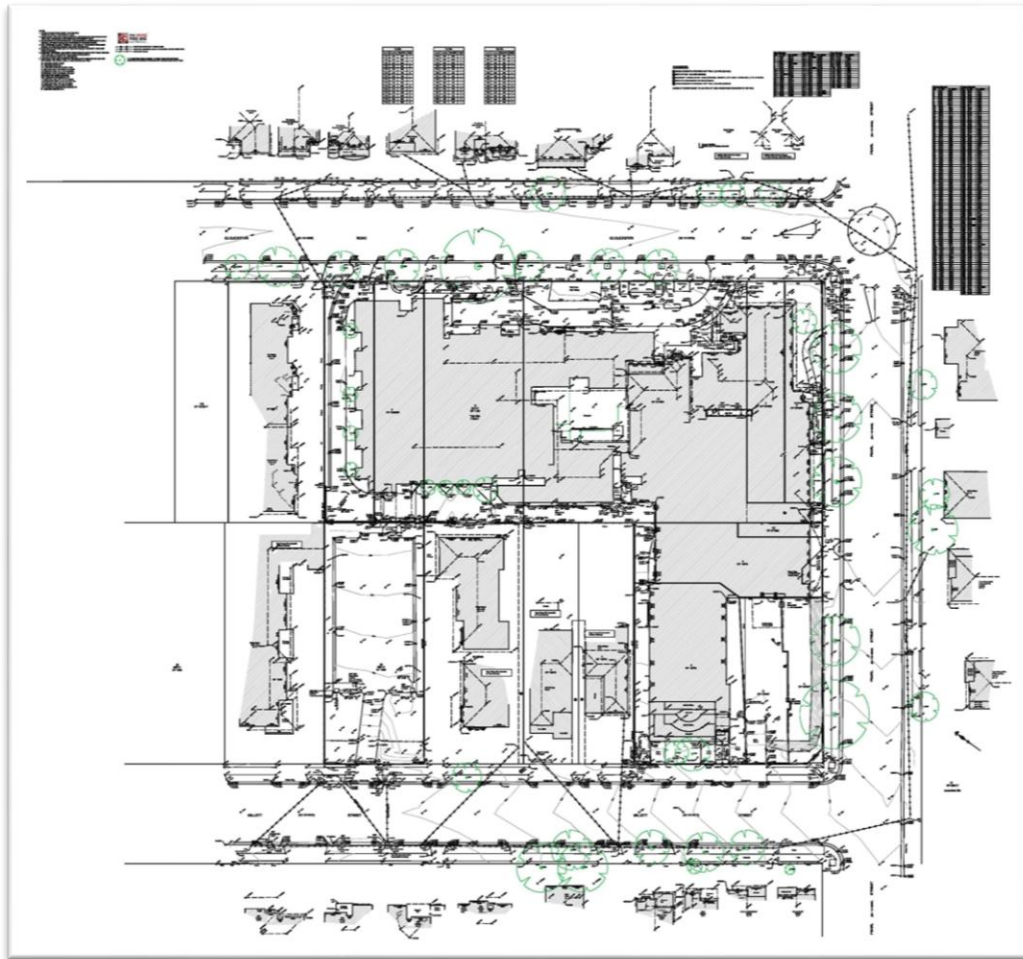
SITE PLAN SHOWING EXISTING HOSPITAL IMPROVEMENTS (SOURCE: MITCHELL LAND SURVEYORS)
